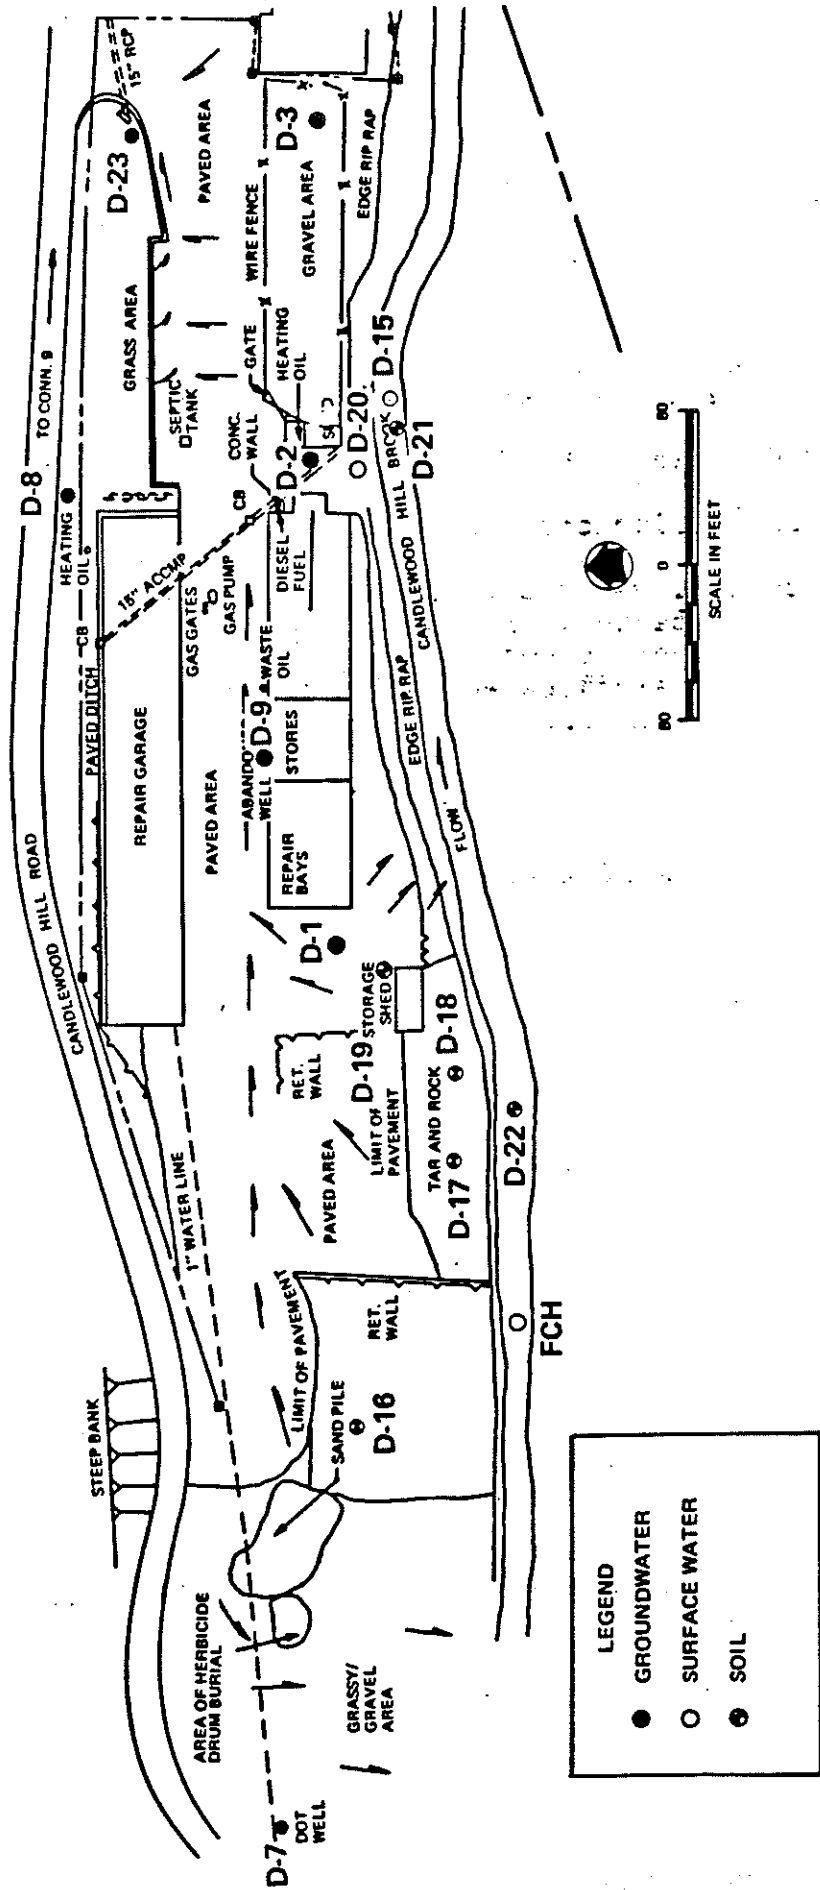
DETAILED TEST SAMPLE LOCATIONS - HADDAM (HIGGANUM) FACILITY
